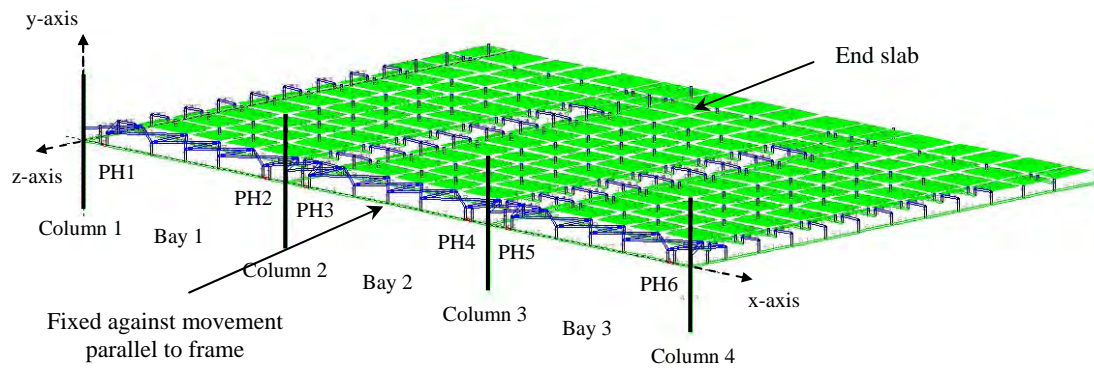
Layout of the 3-bay perimeter frame-floor model
